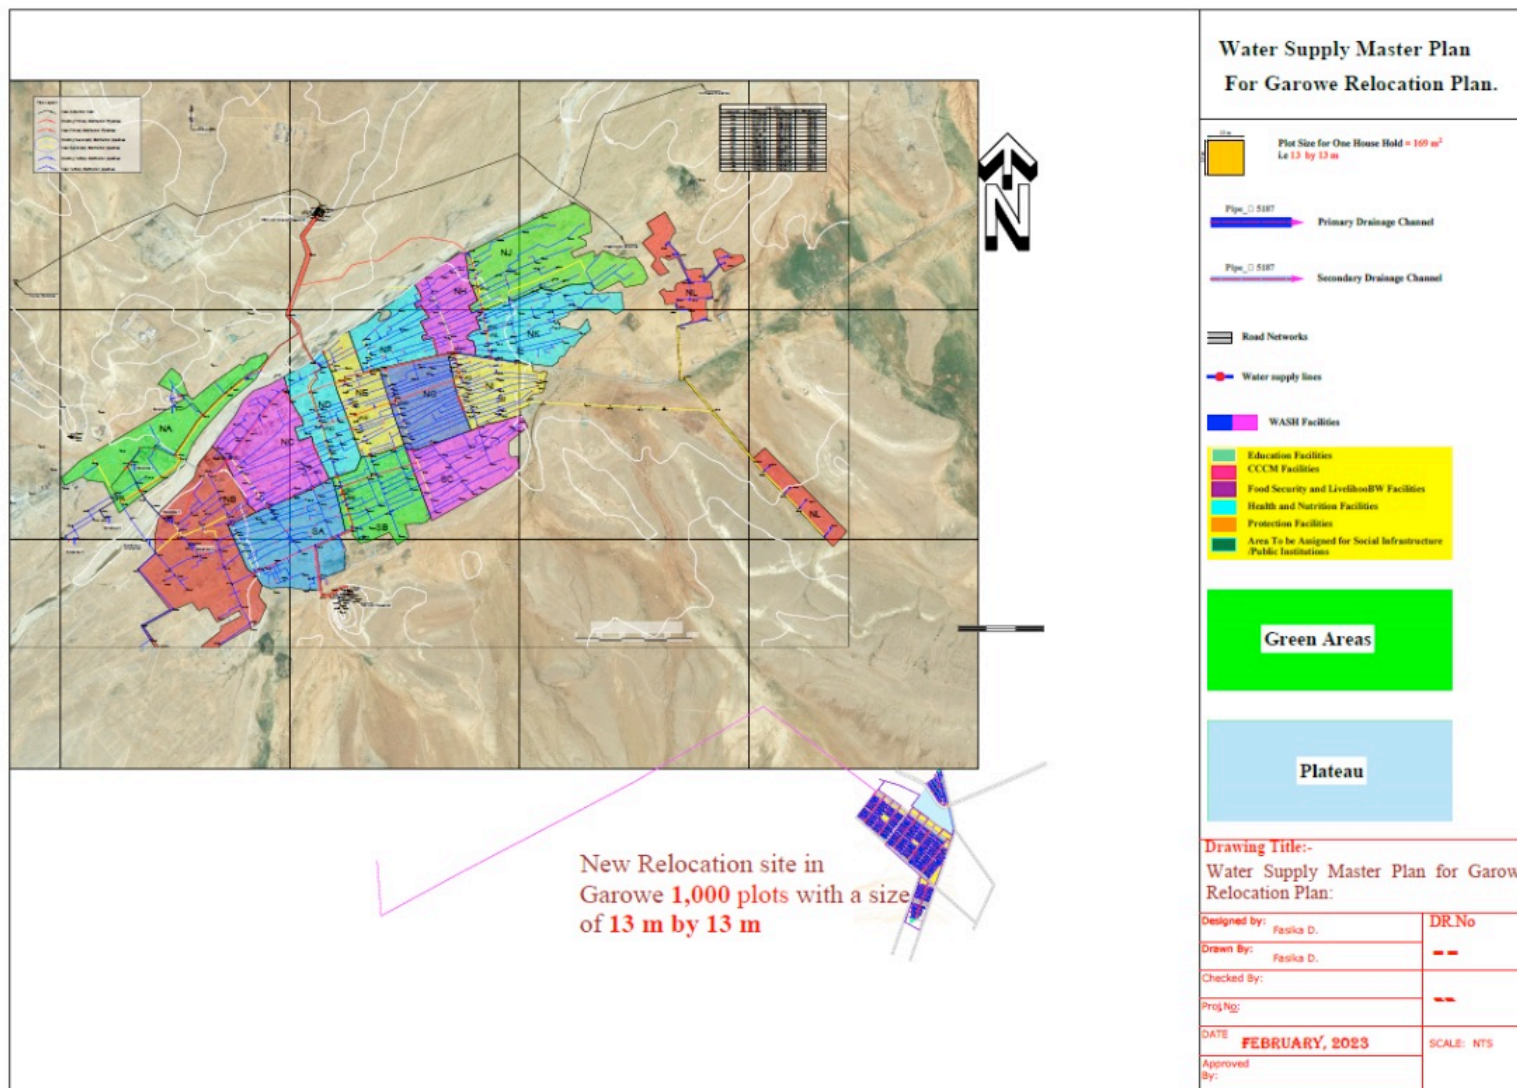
Water supply master plan for Garowe (including the planned new relocation site)
